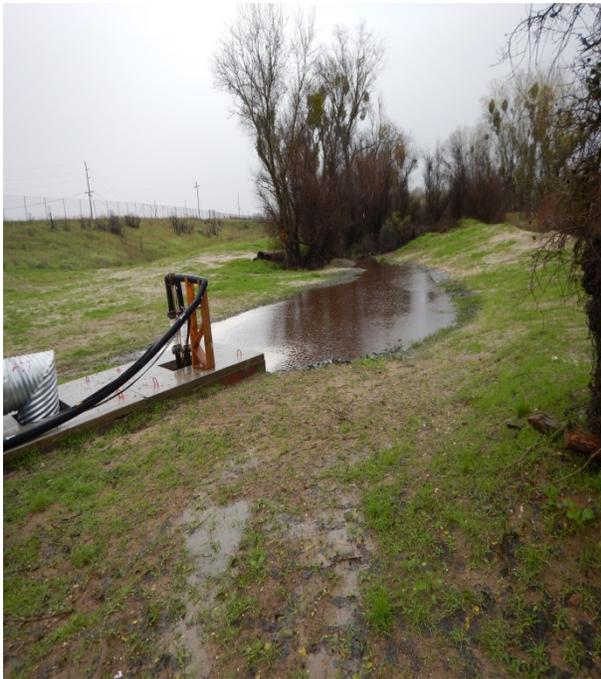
Looking down drainage from sumps. Note ponded leachate draining to offsite Hog Farm area.
